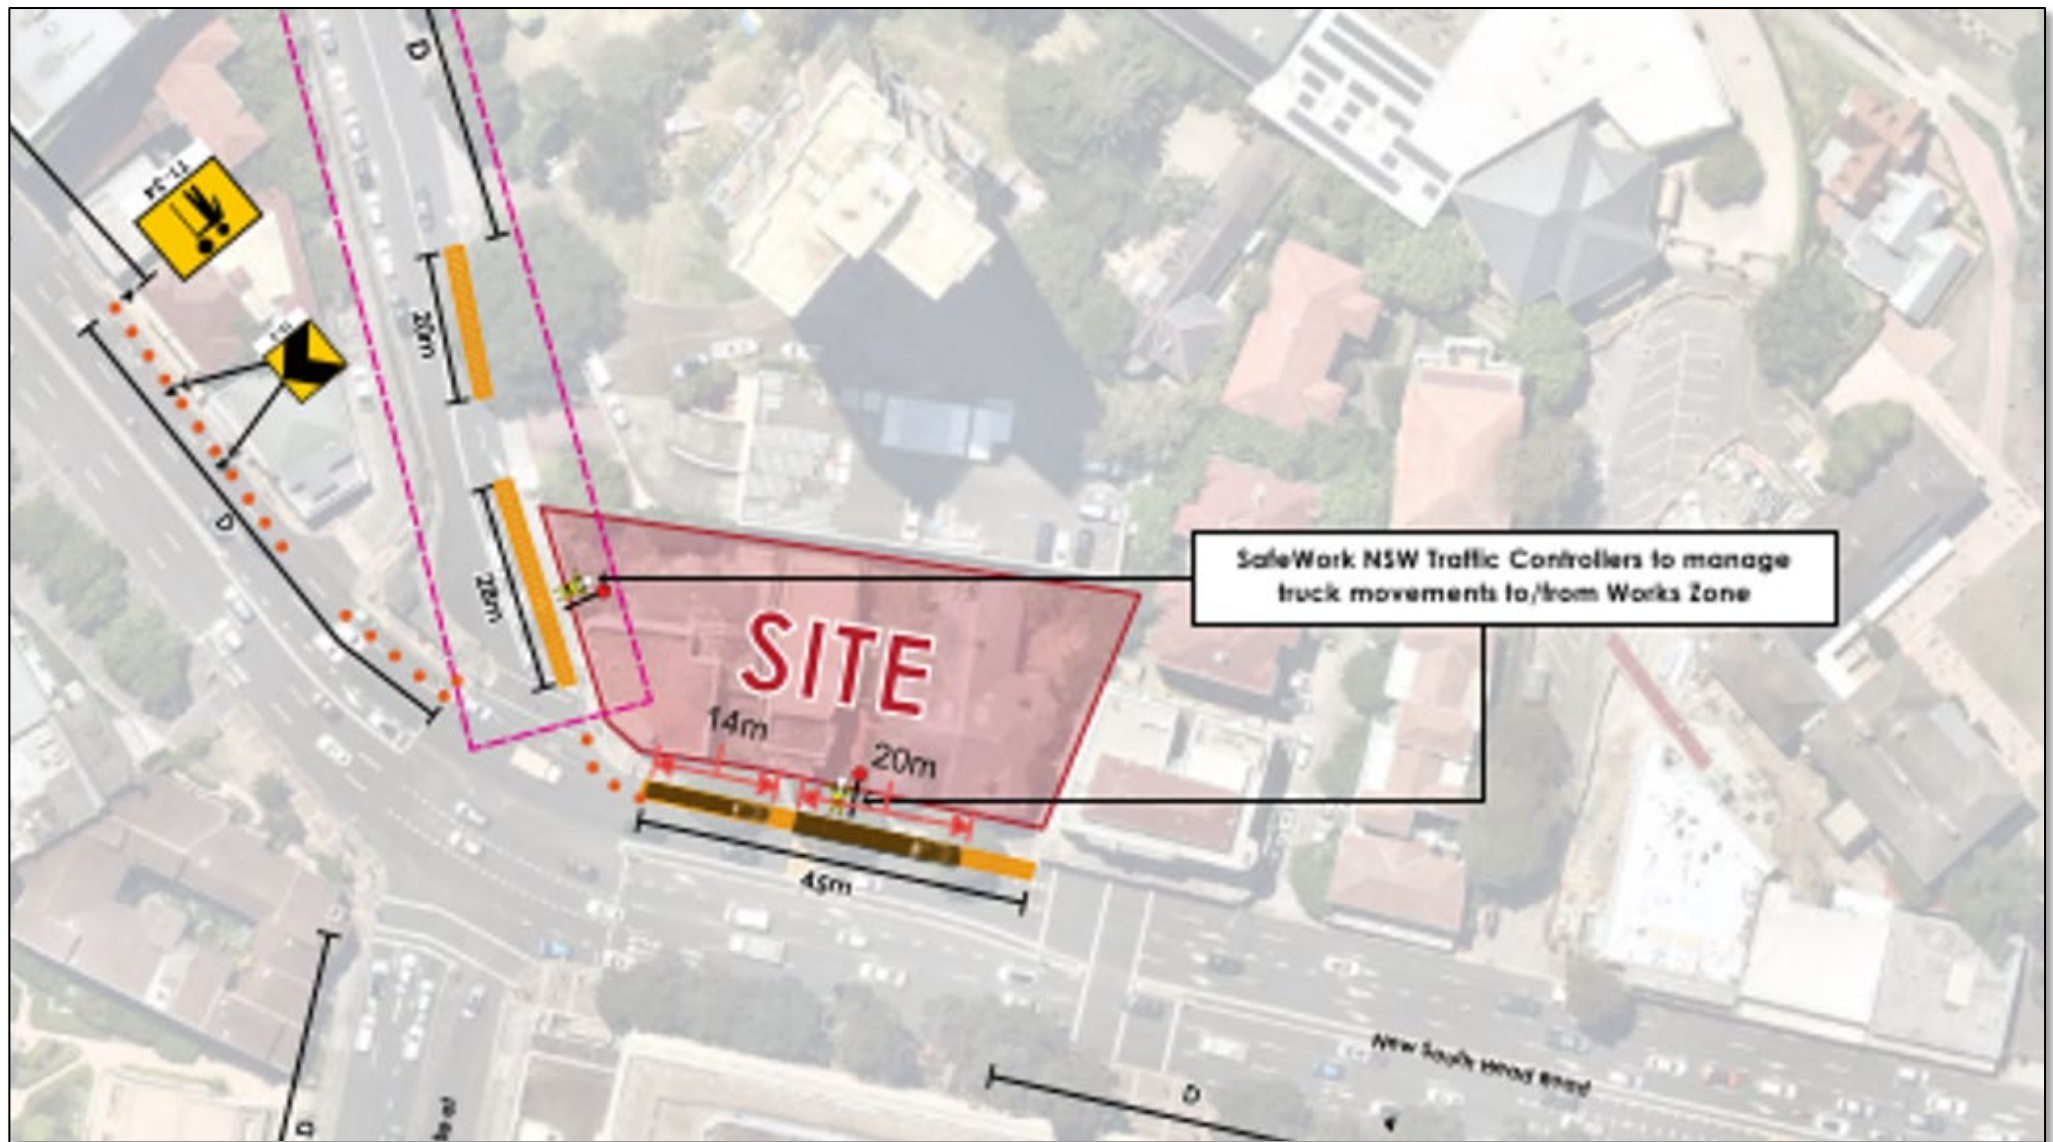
Amended plan showing truck locations with hoisting zone reduced.
